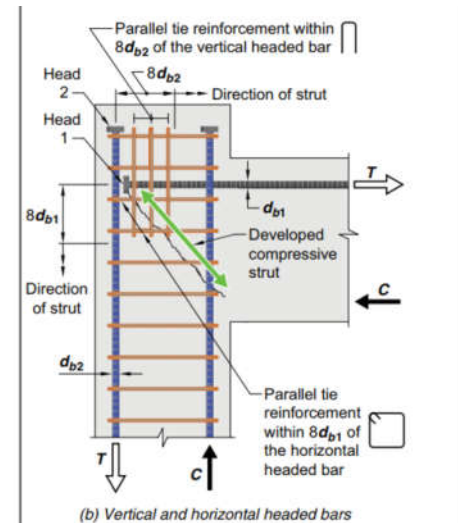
Ties or stirrups placed parallel to the headed beam bars being developed in a beam-column joint that contribute to anchorage strength.
